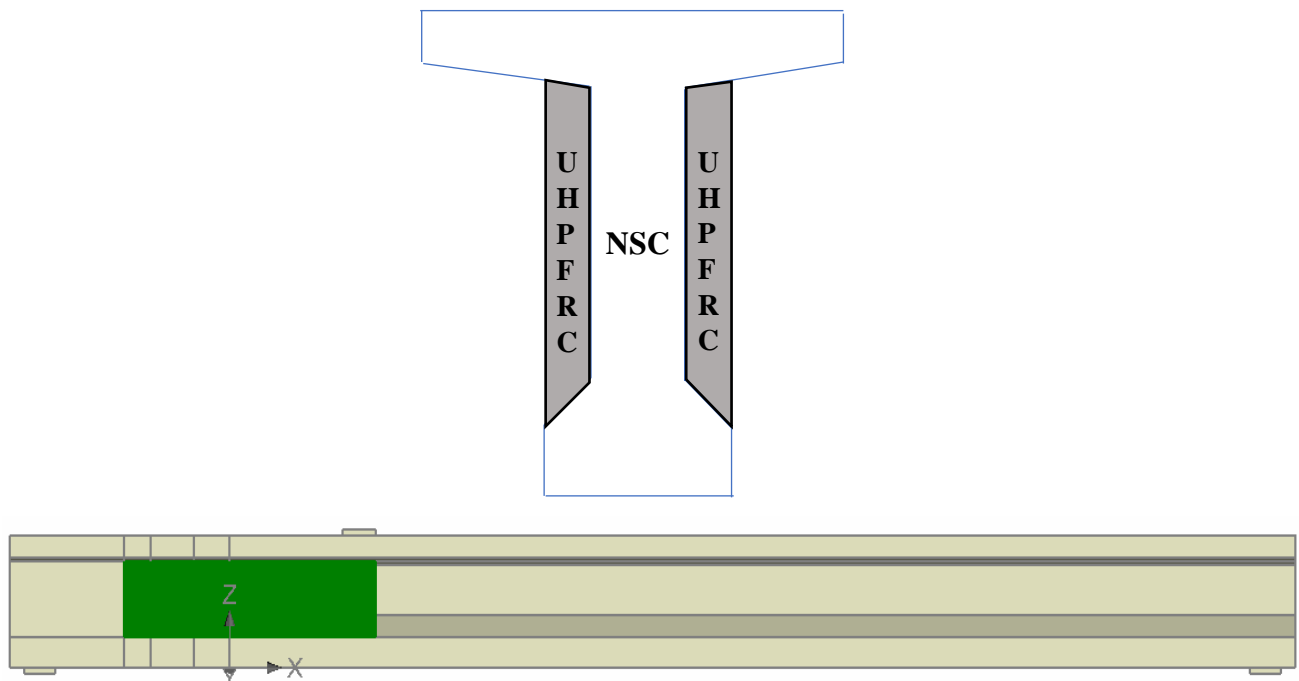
Configuration for strengthening of T beam - Cross-section (top) & Span (bottom).
